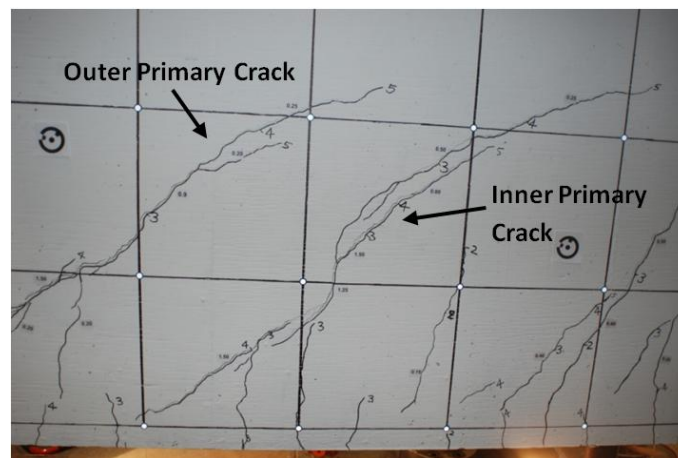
Specimen S1000-B2 Primary Cracks on West End
